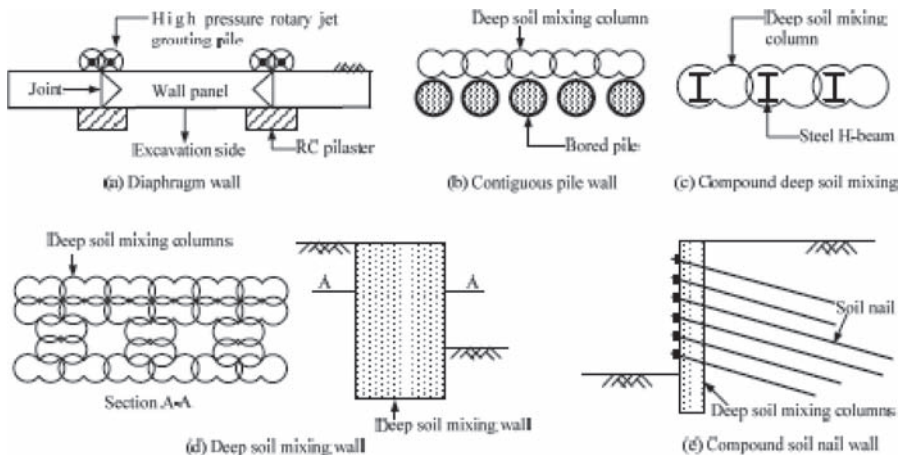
Sketches showing some typical retaining wall types used in Shanghai (from Wang and Xu).
